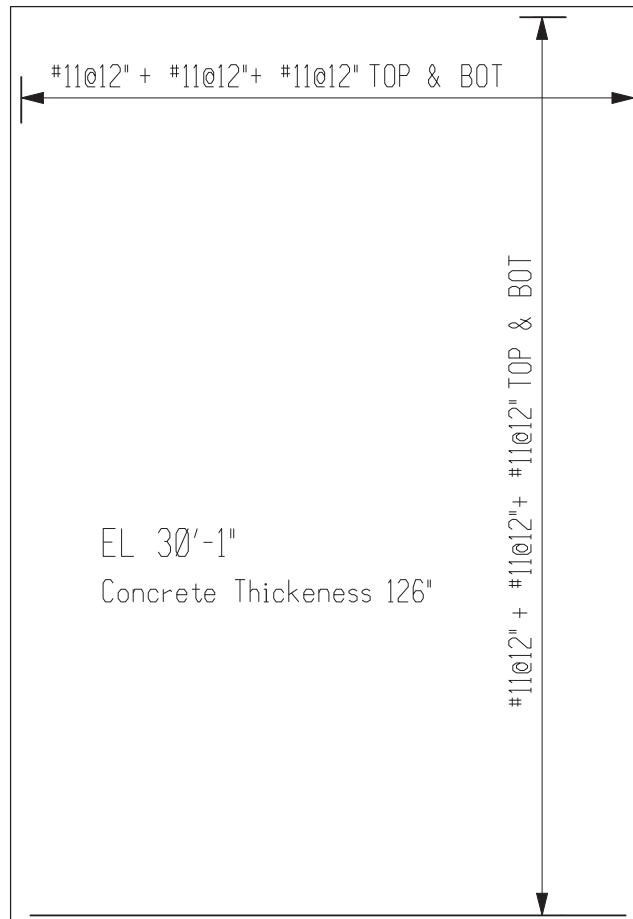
Typical Reinforcement in Spent Fuel Pit Slab – AREA 3
